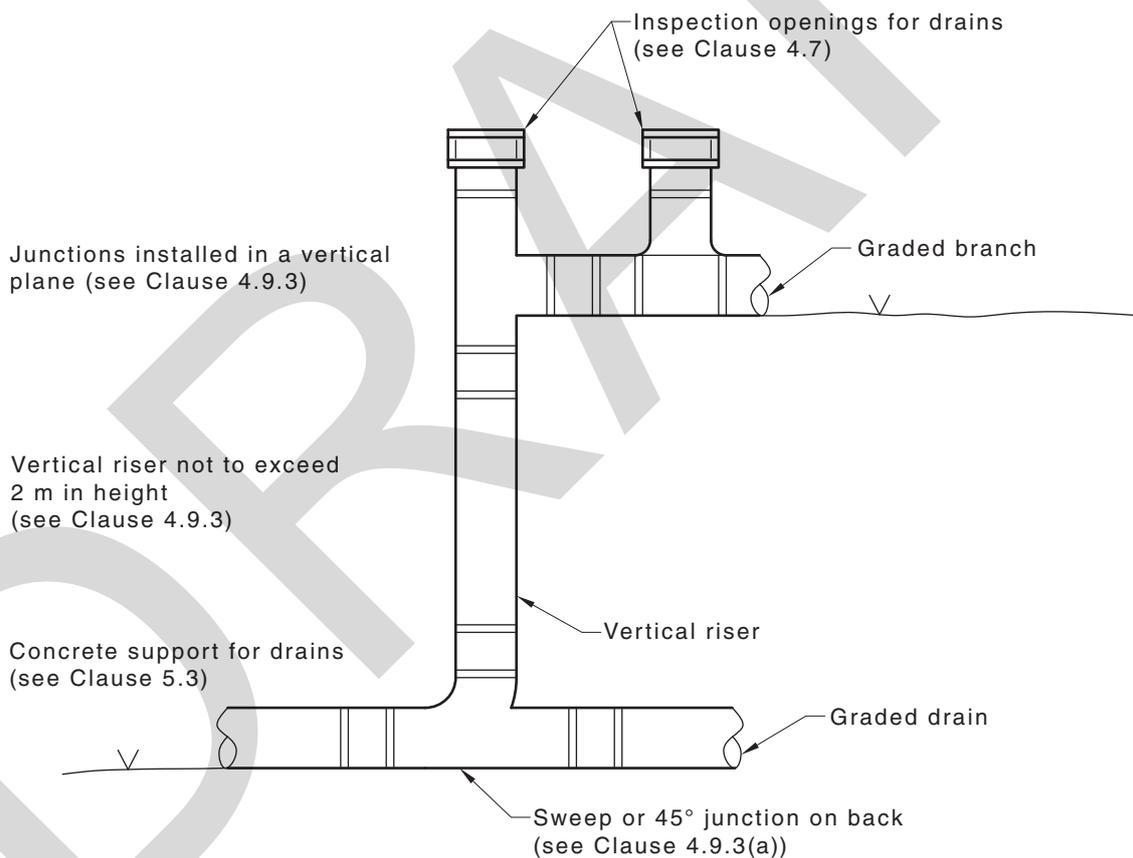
TYPICAL VERTICAL JUMP-UP FROM MAIN DRAIN TO GRADED BRANCHES
